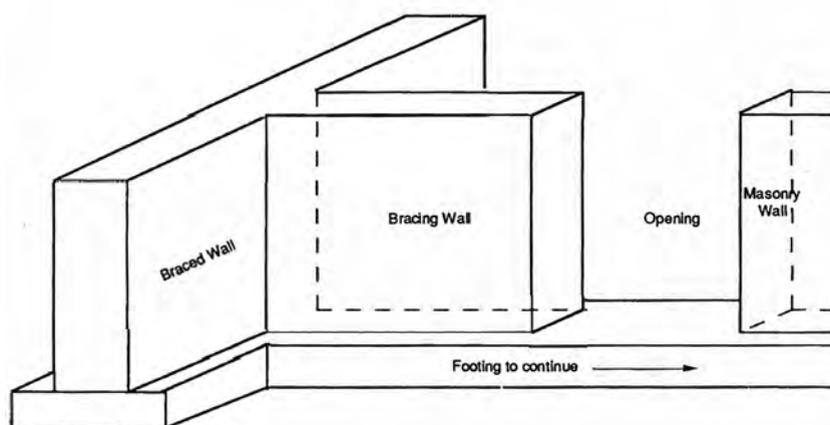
EXAMPLE OF FOOTING OF ISOLATED STRUCTURAL WALL
